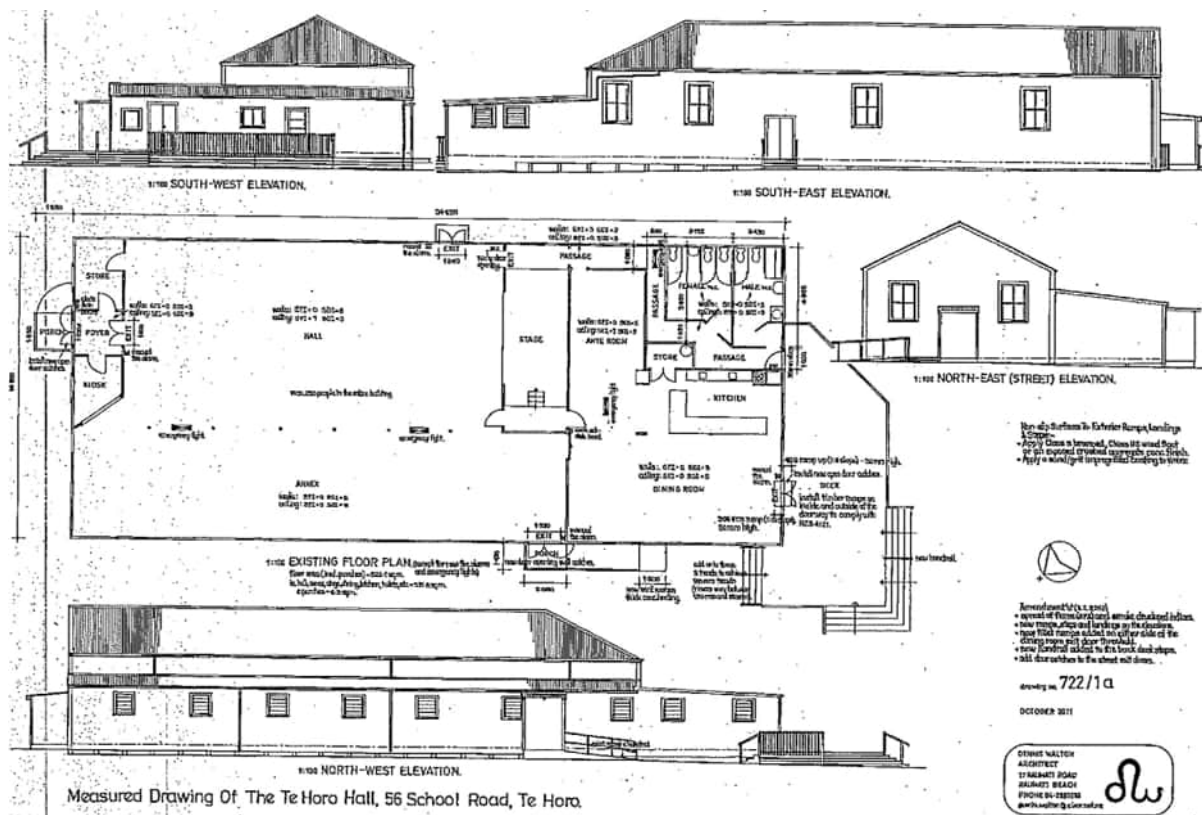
Floor plan and elevations of Te Horo Hall, prepared by Dennis Walton Architect, 2011. Source: KCDC Property File ref. RM12002.
